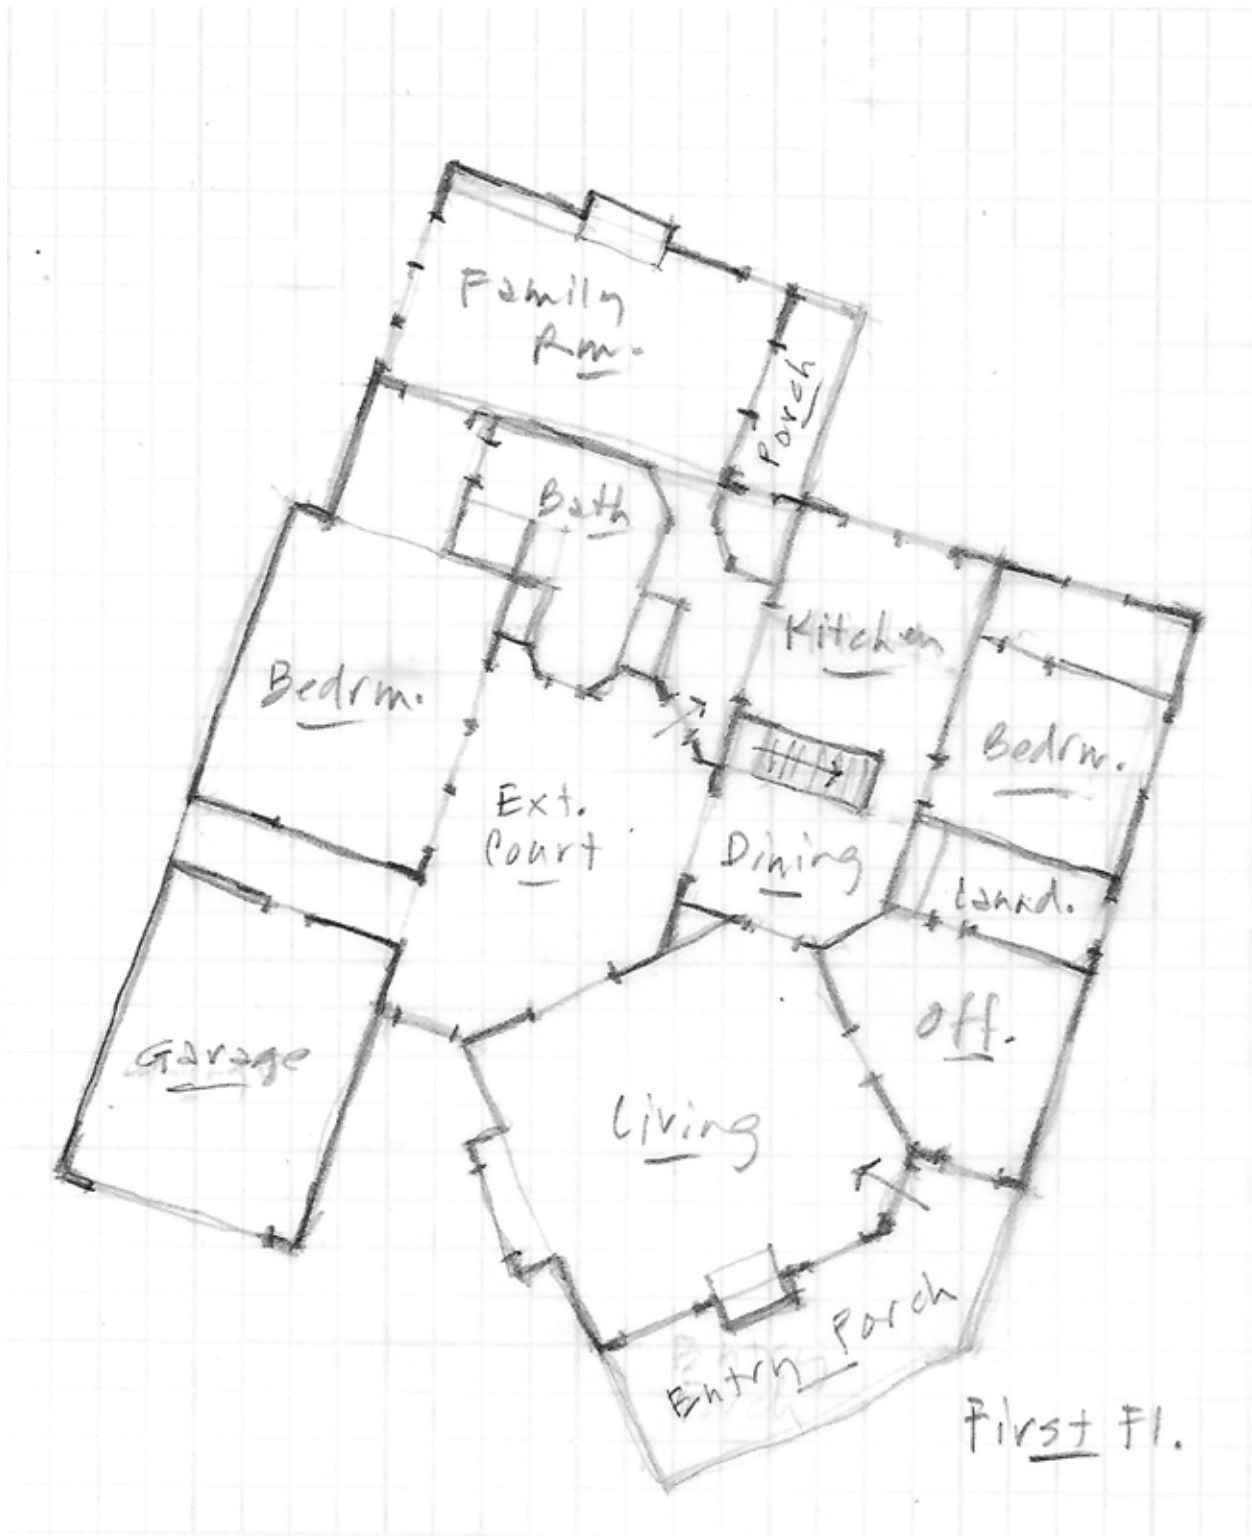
1850 Alameda Diablo – First floor plan (south is up)
